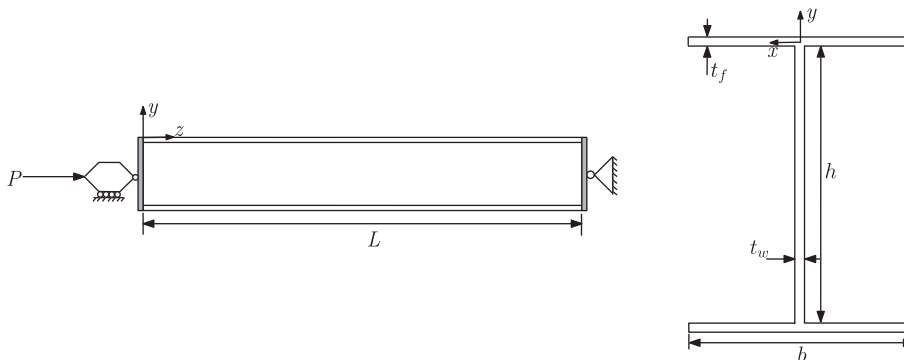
An I-section strut under axial loading P , elevation (left) and cross-section (right). The ends are simply supported and a rigid end plate transfers the load equally to the flanges.
